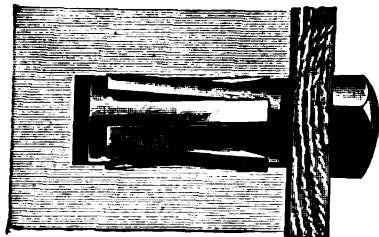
CRESCENT EXPANSION BOLT IN PLACE AND GRIPPING SIDES OF HOLE.
